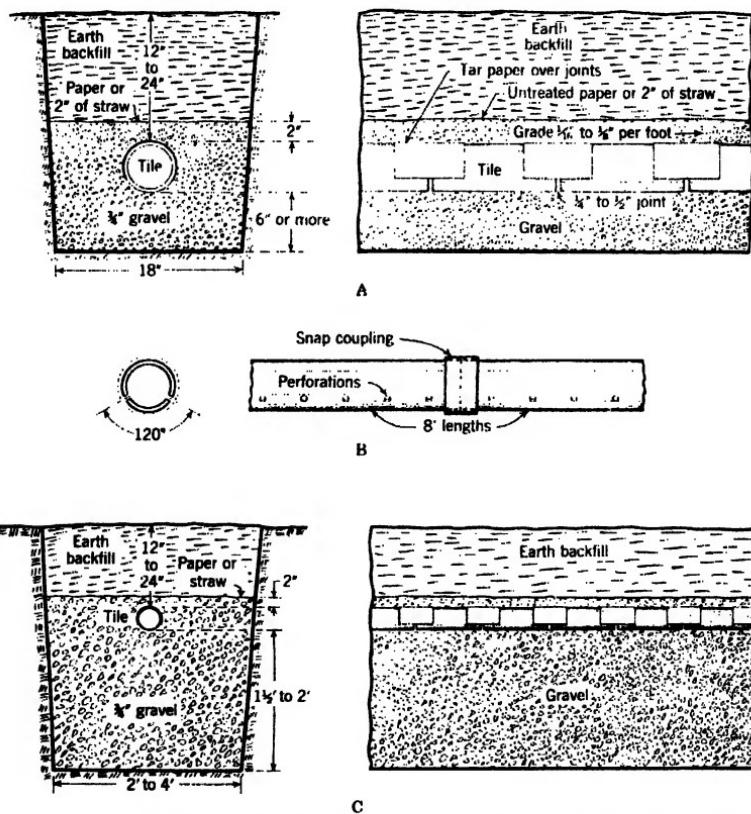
Construction of disposal trenches. A—Construction for porous to medium heavy soils. B—Perforated bituminized disposal pipe which can be used in place of the drainage tile shown at A and C. C—Trench construction for heavy soils, and for a location where space is a limiting factor or where tree roots are encountered. The larger trench provides more absorption area per lineal foot of trench.
